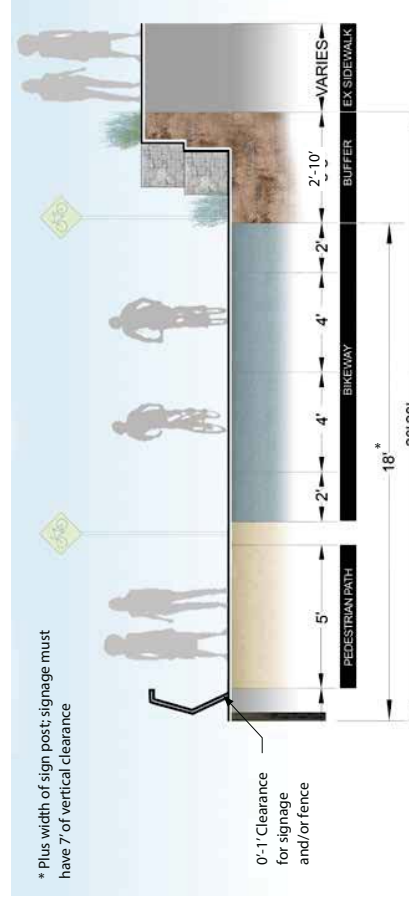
Hazeltine Avenue to Woodman Avenue - Typical Cross Section
